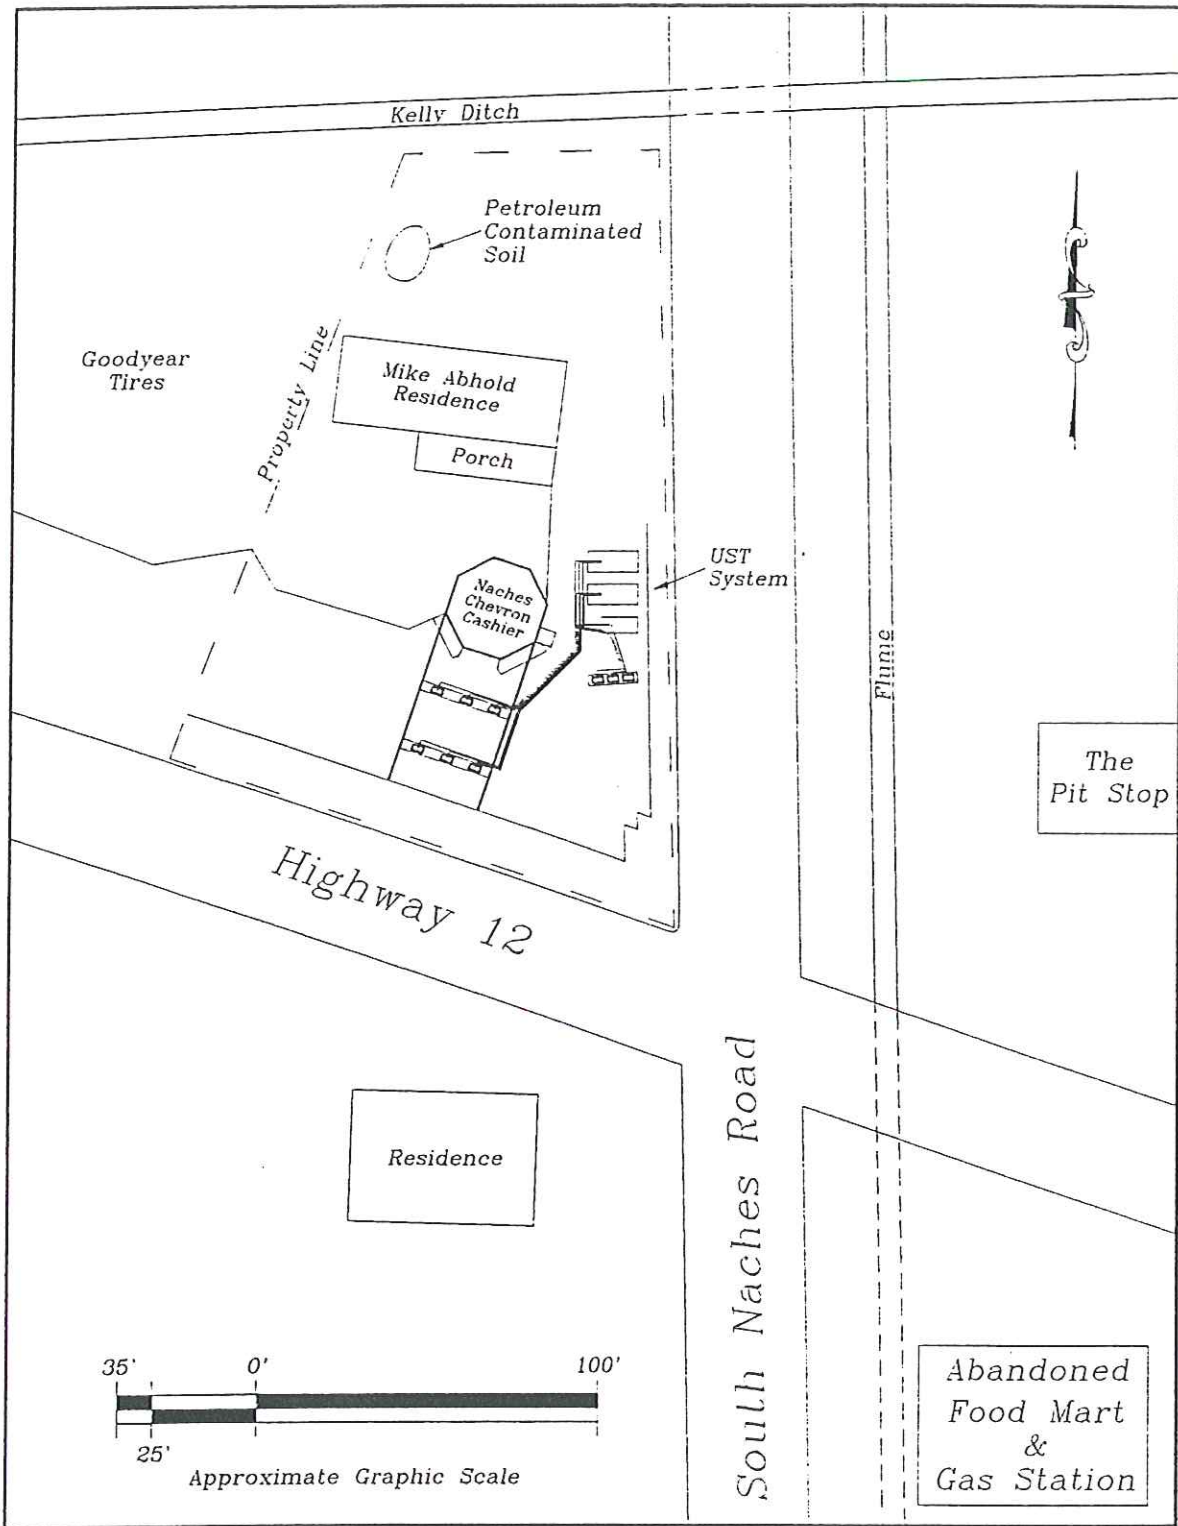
Sketch of Site Layout Showing Adjacent Properties
